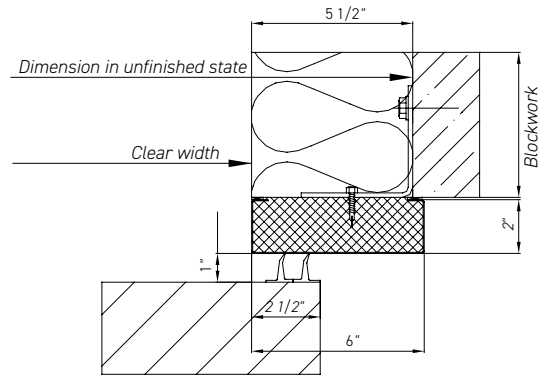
Blockwork / Flat frame, bracket mounting
